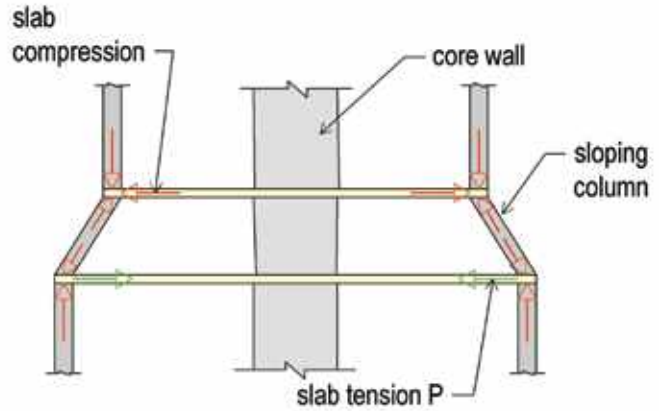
Mechanics of generation of tensile forces in the lower slab in spreading the load from smaller to larger slab footprint
